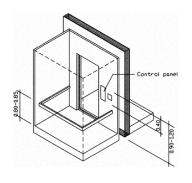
Accessible Elevator and Corridors with handrails and tactile markers
